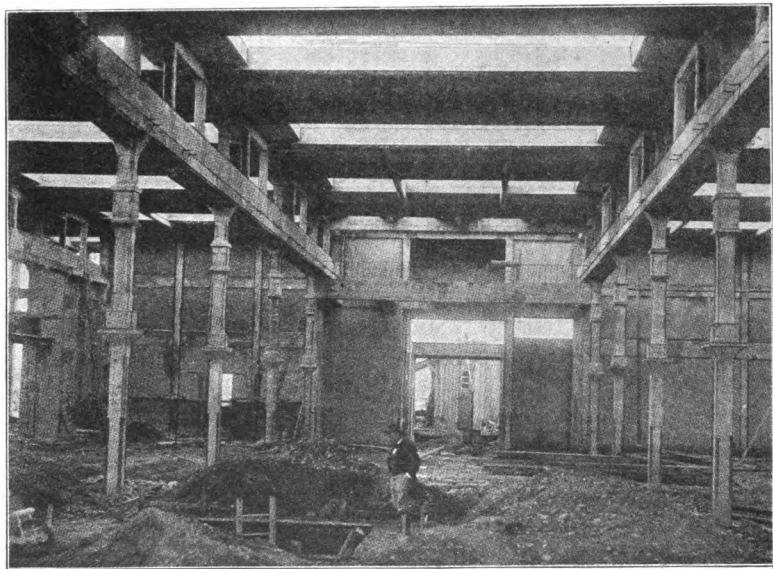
Foundry Building of Armored Concrete Construction. The columns support a track for a 30 ton traveling Crane. Note holes in columns for attaching bearings of radial drilling machines.
